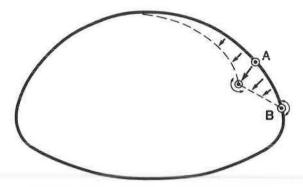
Schematic representation of observed failure mode of 28-ft span pipe-arch culvert near Cooper City, Florida.
